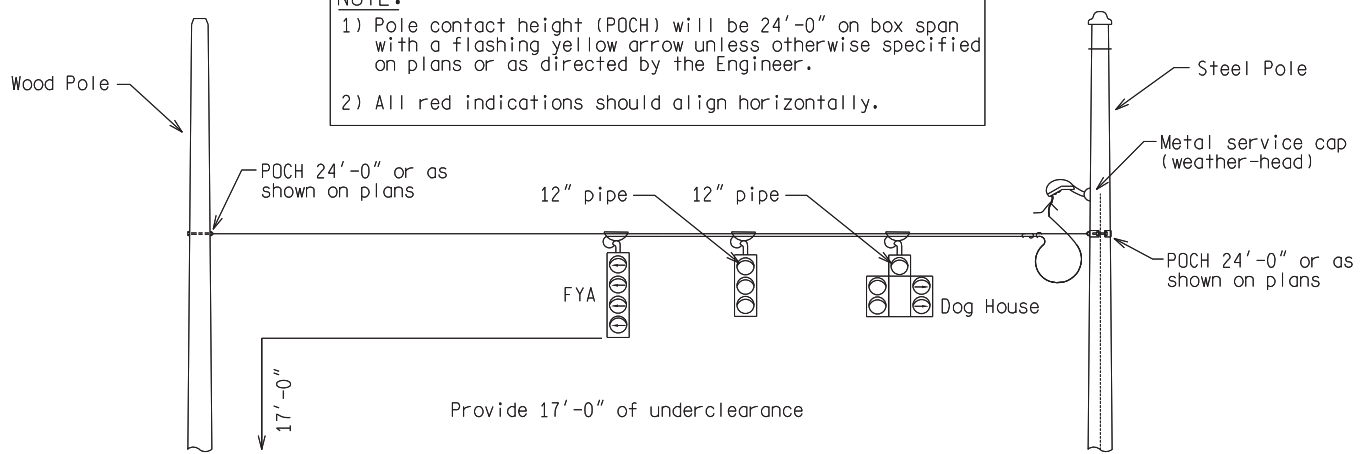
DETAIL A: INSTALLATION OF BOX SPAN WIRE T.S. ON STEEL OR WOOD POLES
